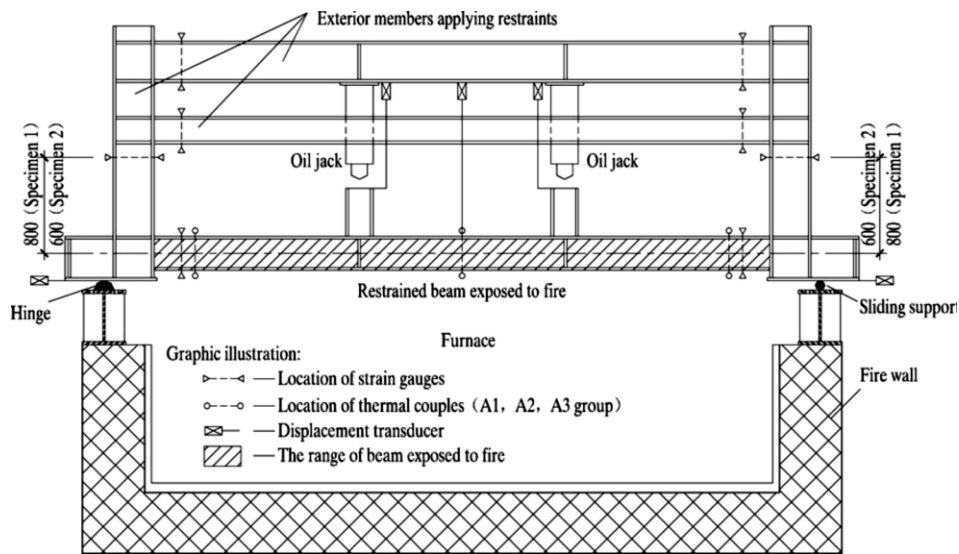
Li's Test Setup and Arrangement of Instruments (Li and Guo, 2007)
